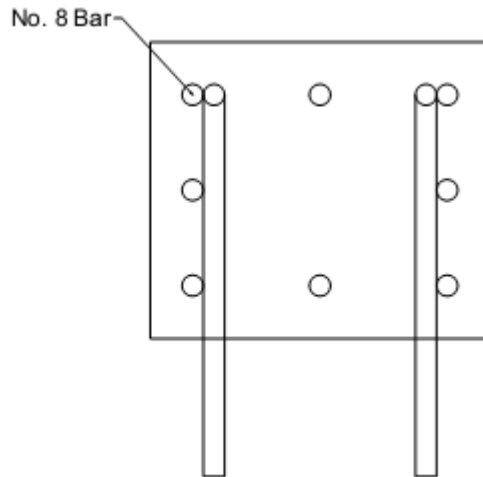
Longitudinal column reinforcement-8 No. 8 bars (distributed across four column faces). Transverse reinforcement not shown.
